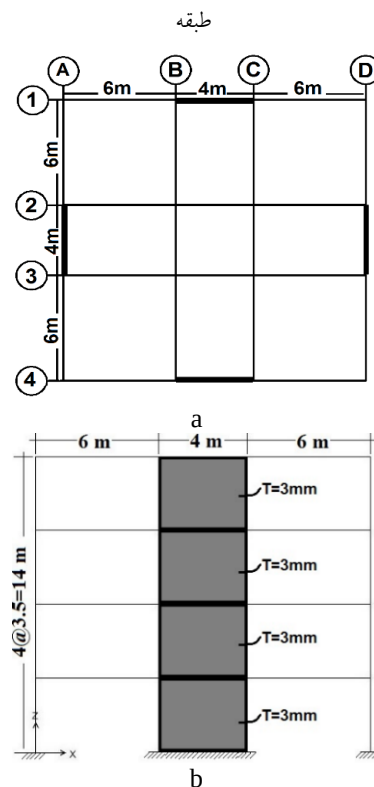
a) Dual steel shear wall system plan b) floor plan of four story steel shear wall system
